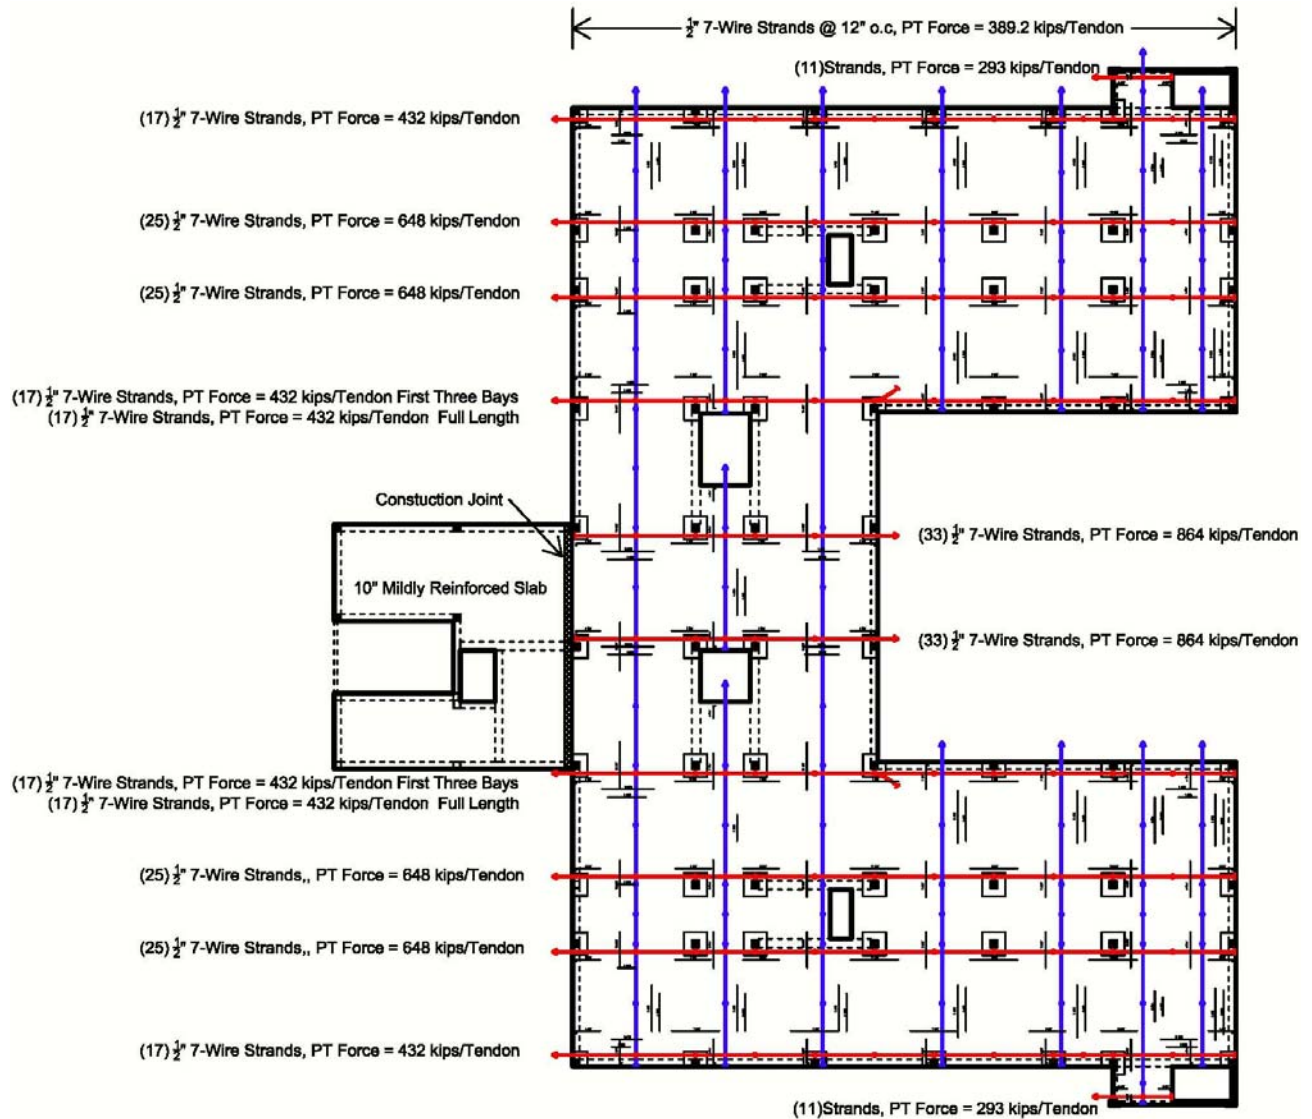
Typical Post-Tensioned Tendon Layout for Moment Frame System
